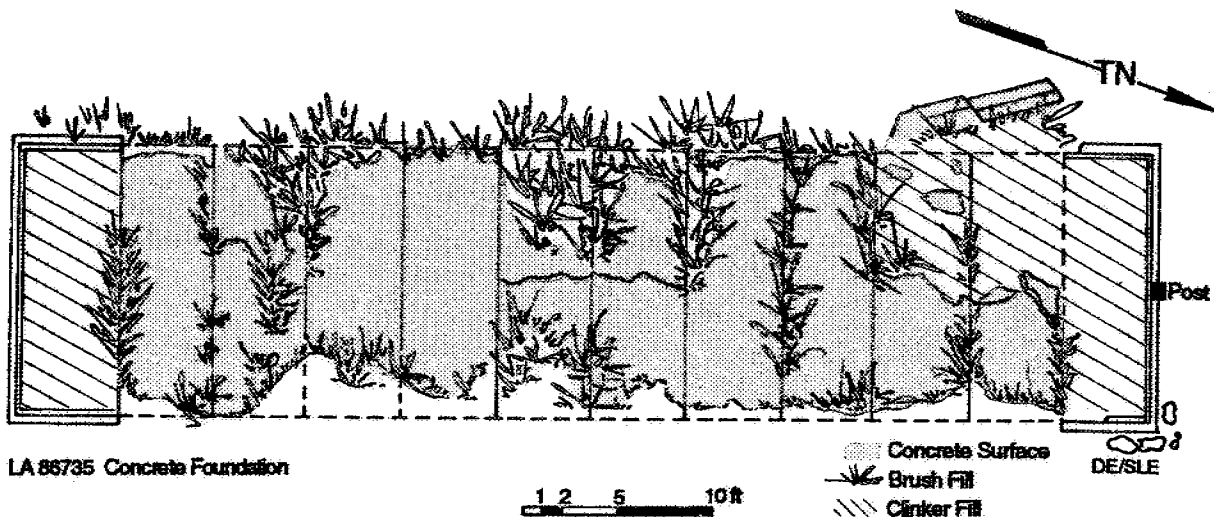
Field sketch (plan view) of historic concrete foundation at Site LA 86735.
